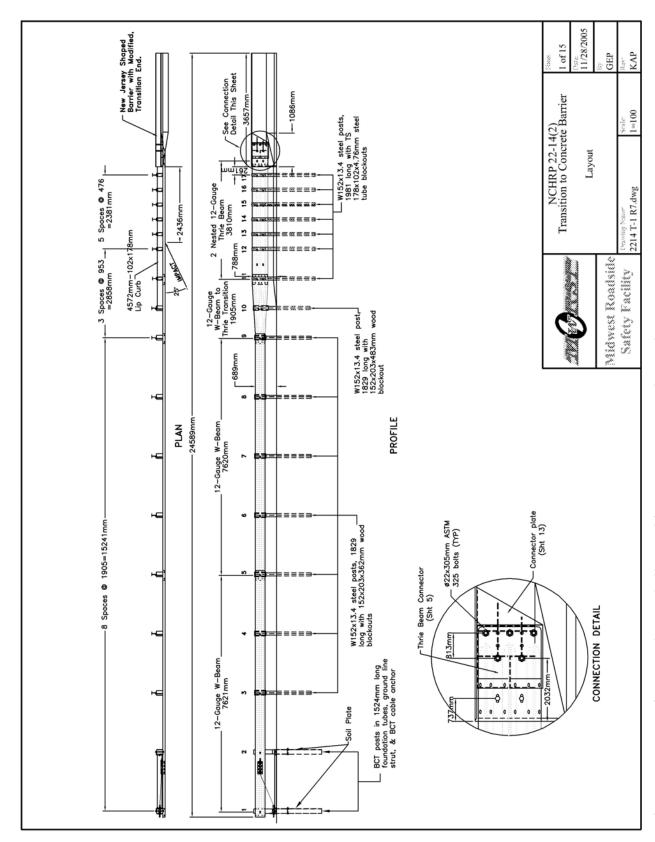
Layout of Approach Guardrail Transition to Concrete Barrier Design
